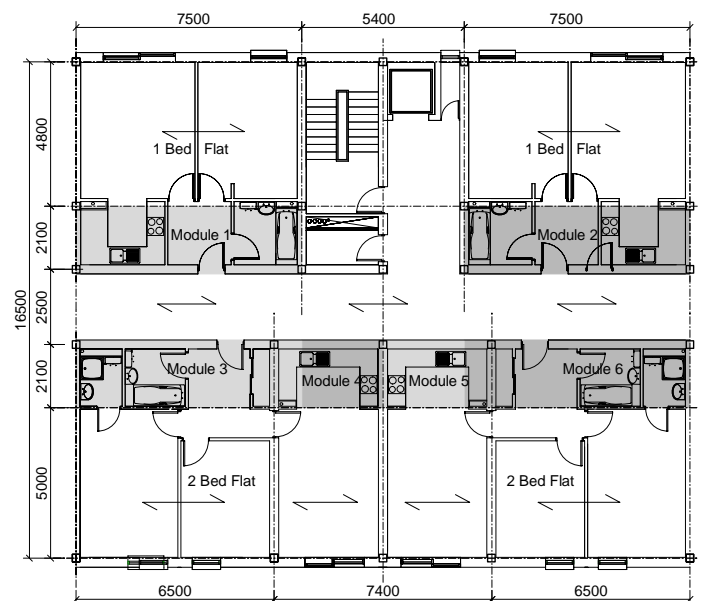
Mixed use of modules and long spanning floor with a primary steel frame
